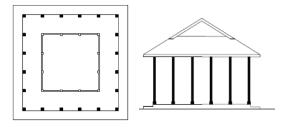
On the left show the typical plan of 'Peristyle Form' and on the right show the typical elevation of 'Peristyle Form'.
